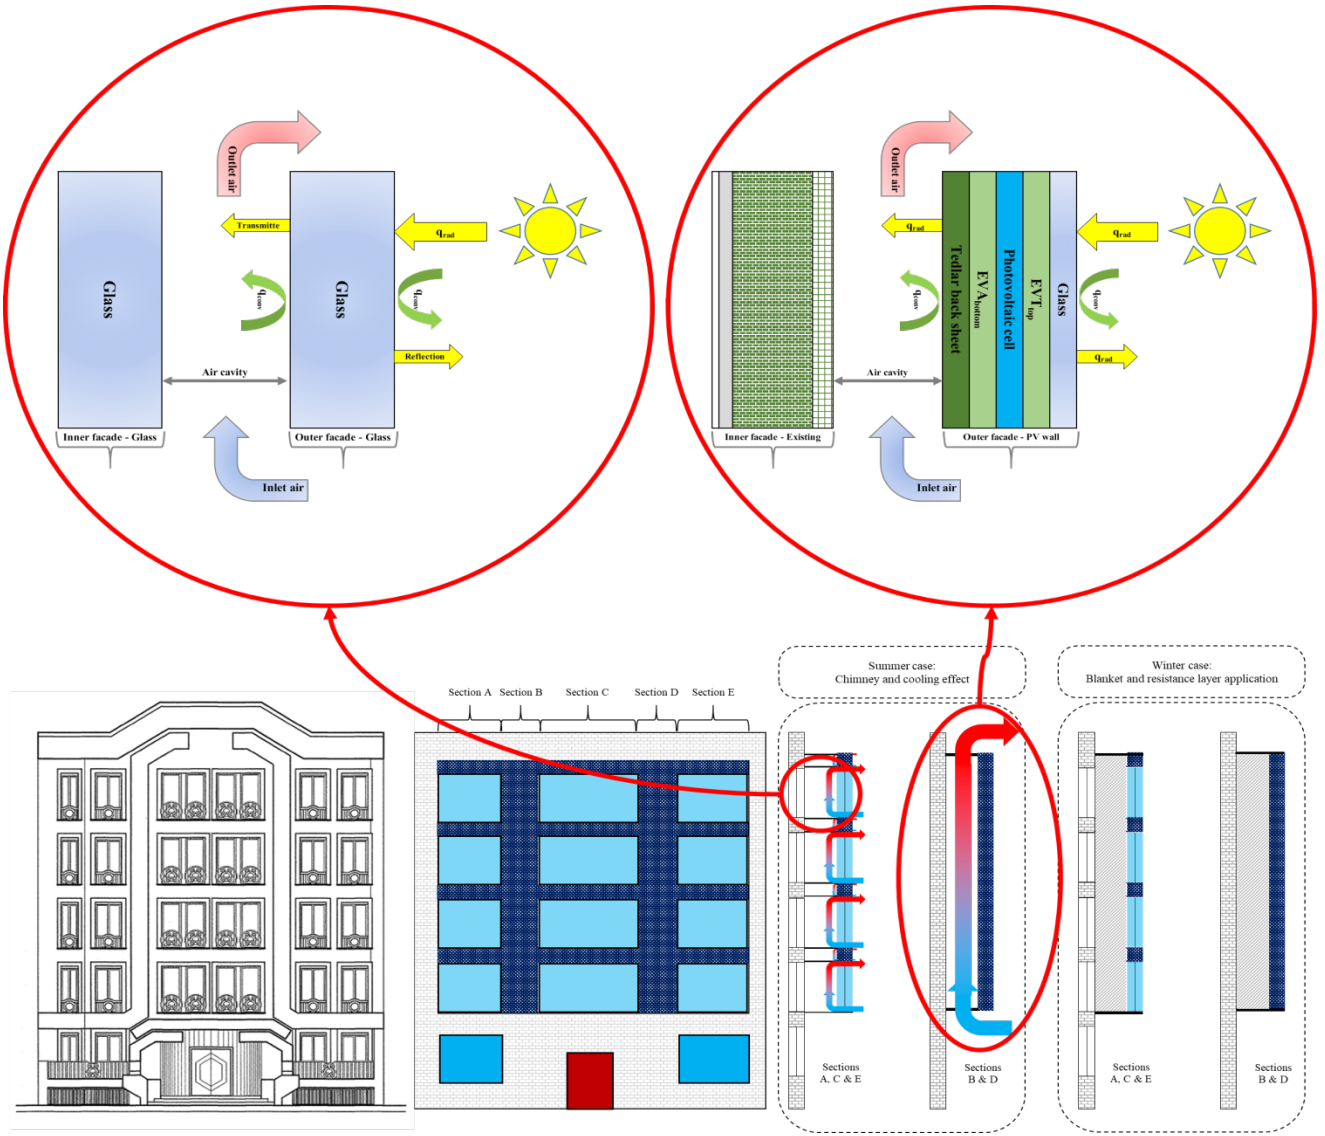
Front view of the existing facade (left bottom) and proposed outer facade as a retrofit solution (middle bottom); side view of outer façade for summer and winter cases (right bottom); side view of double façade with outer window wall (left top) and double façade with outer PV wall (right top).
